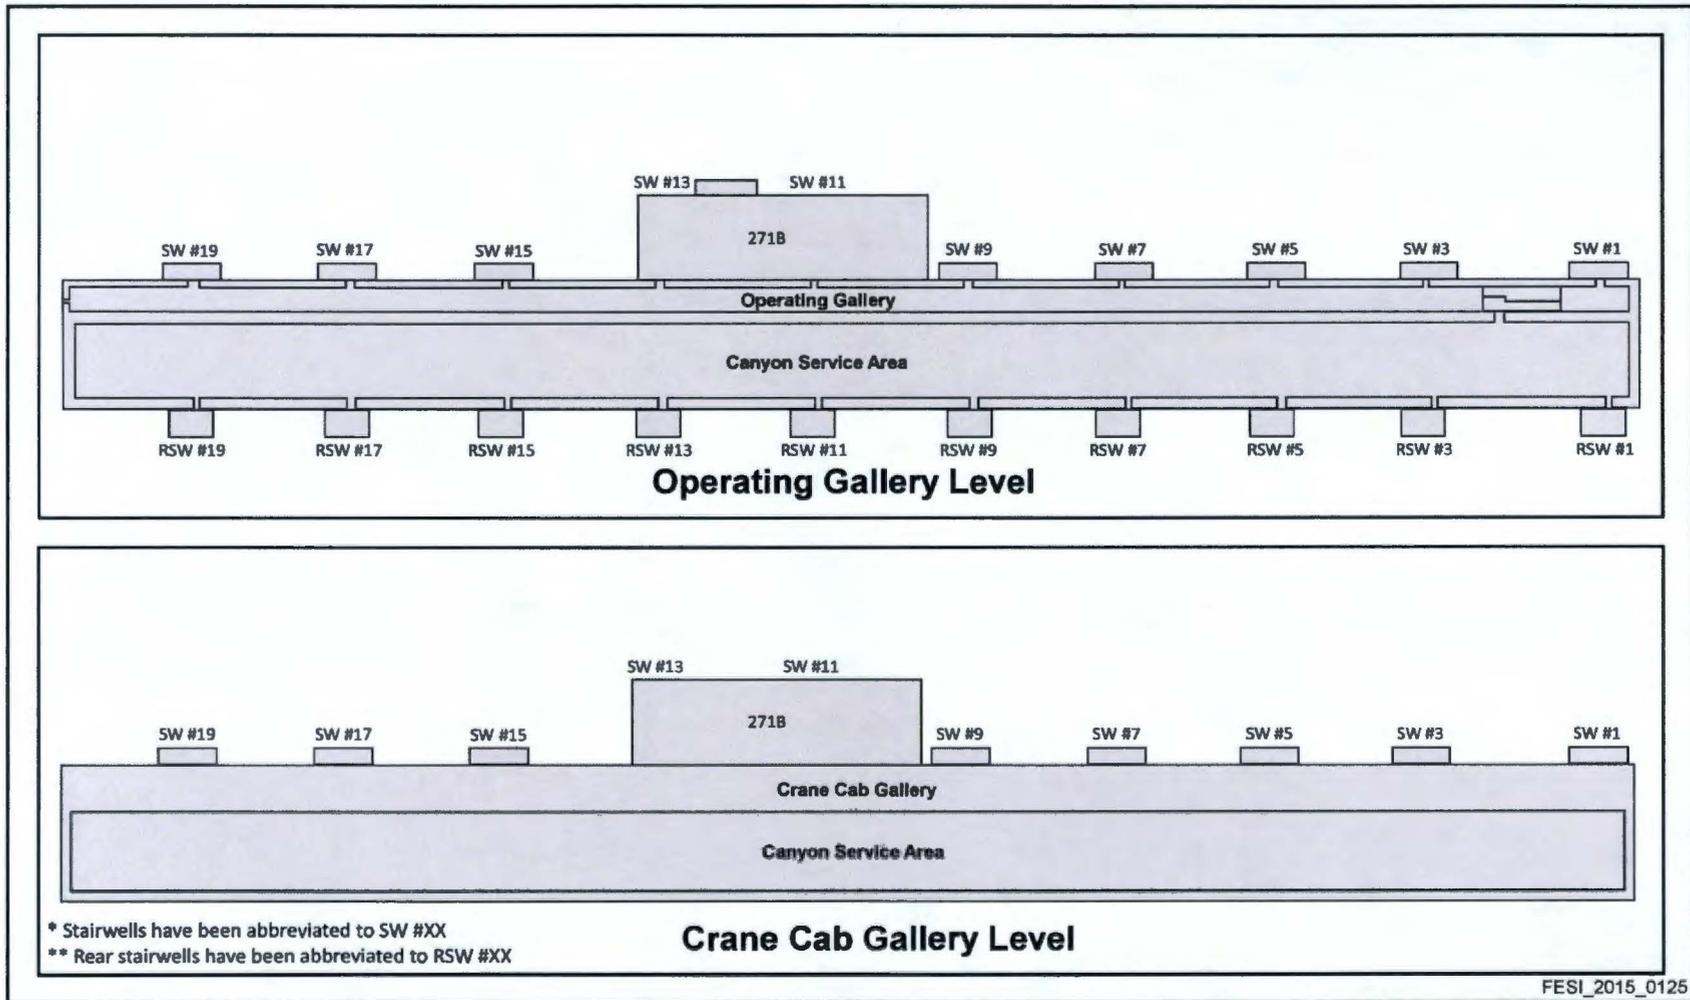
Plan View of the 221B Canyon Building (Above Deck Level)
